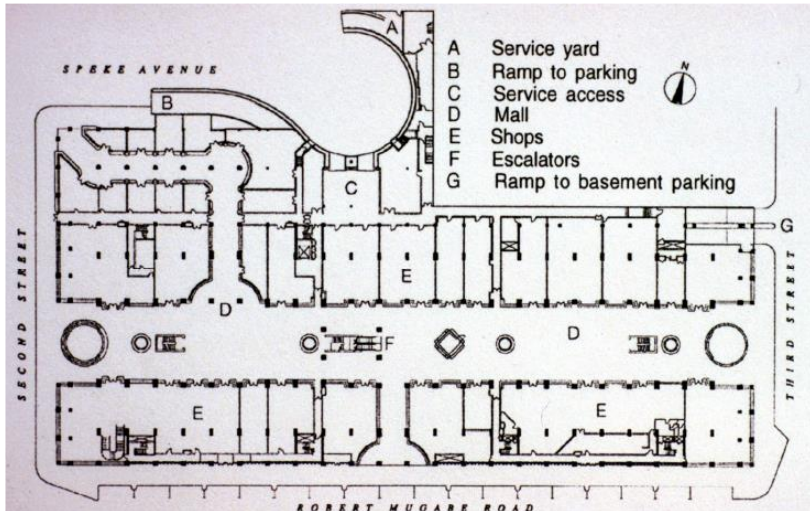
Image showing the Ground floor plan on East Gate Harare.
